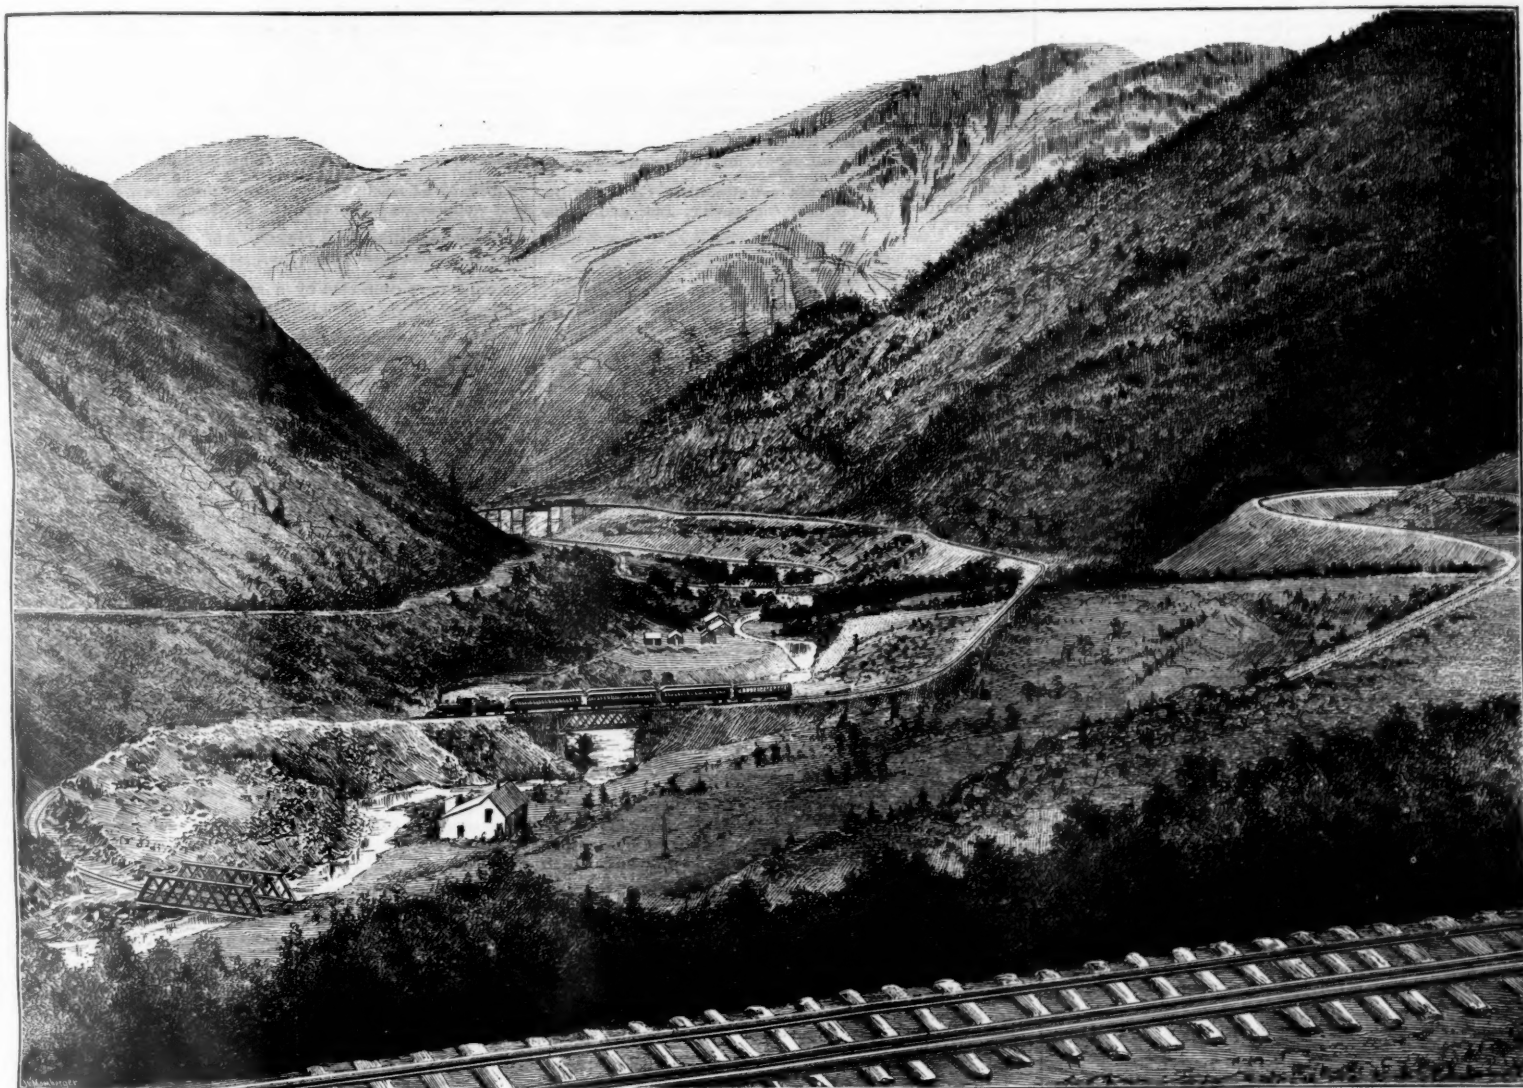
VIEW OF SPIRAL ON GEORGETOWN, BRECKENRIDGE & LEADVILLE RAILWAY, BETWEEN GEORGETOWN AND SILVER PLUME, COL.
